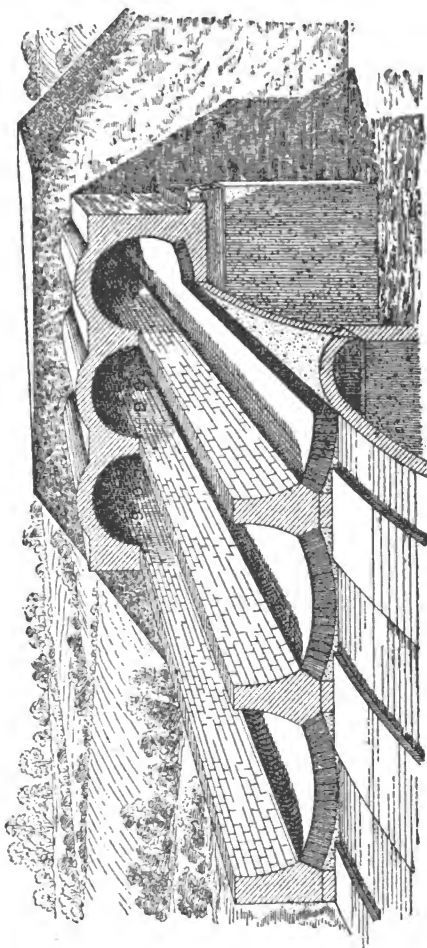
Northern Outfall Sewer. Section of Embankment, Culverts, and Substructure.
